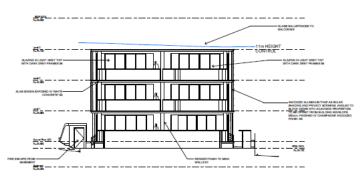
Street elevation, showing the building within the 11 metre height limit (blue line)
